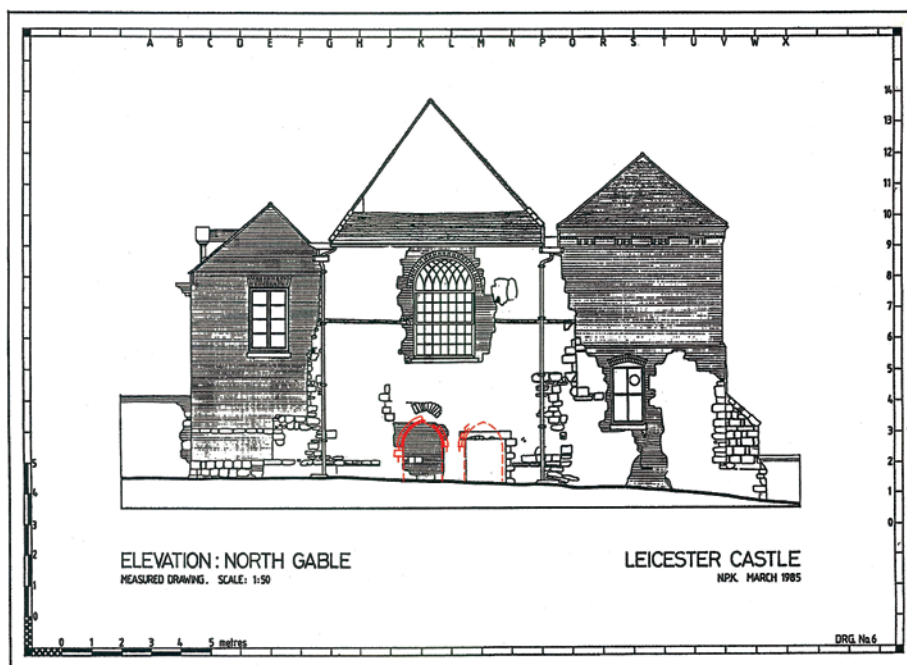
North gable survey elevation drawing of 1985, with the internal profile of the two blocked doorways added. *Drawing N Klee, with addition by Mathew Morris (ULAS).
